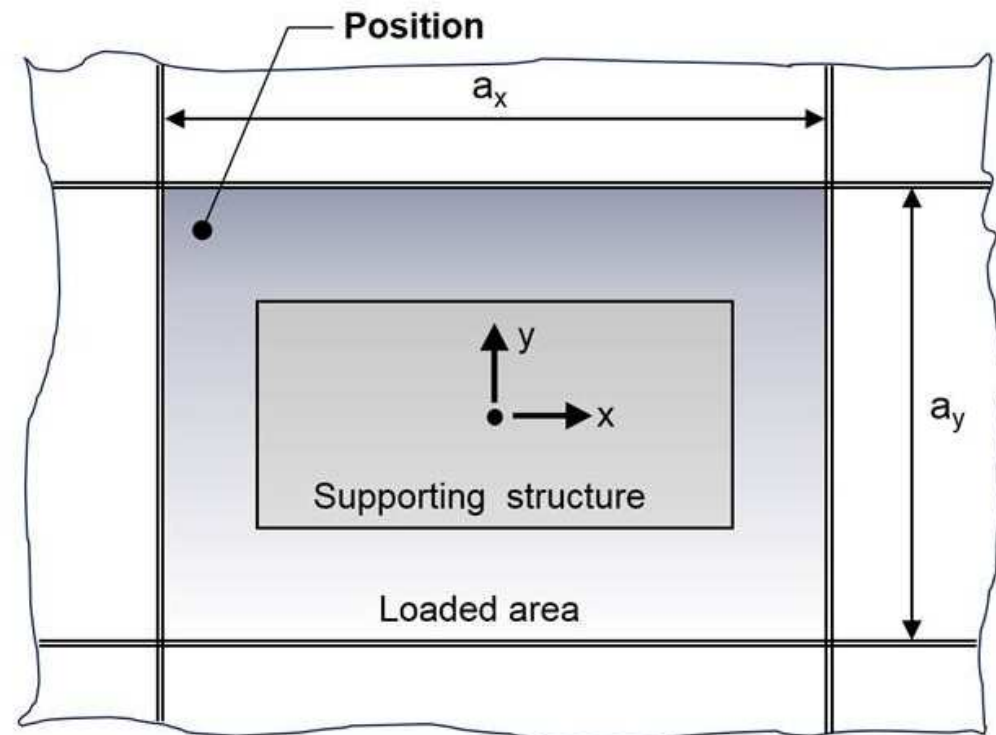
Scheme layout of a shoring unit as segment of a formwork pattern e.g. for a slab under construction
